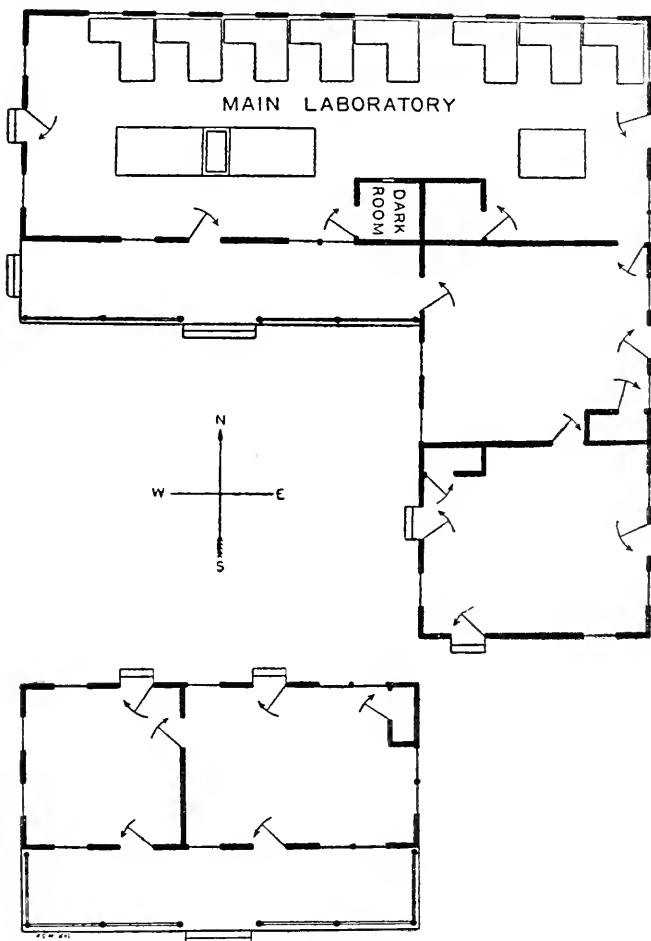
Plan of Laboratory Buildings at Tortugas, Florida.
